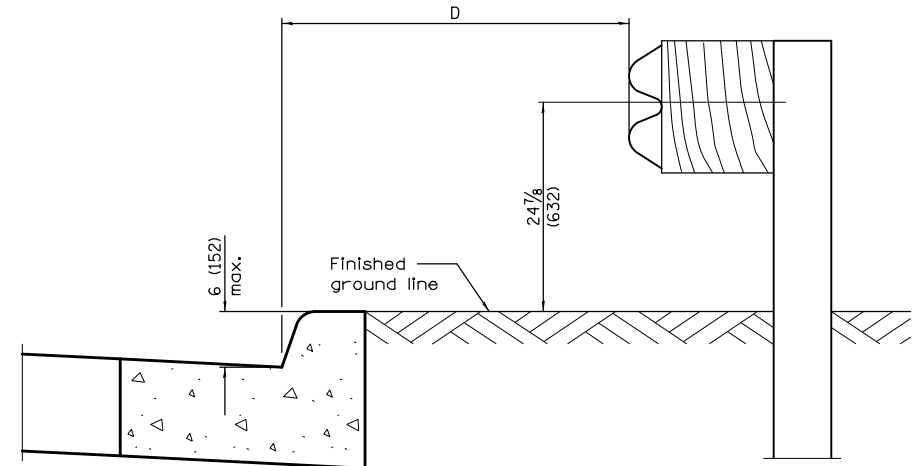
¹/₂" STEEL PLATE BEAM GUARDRAIL
